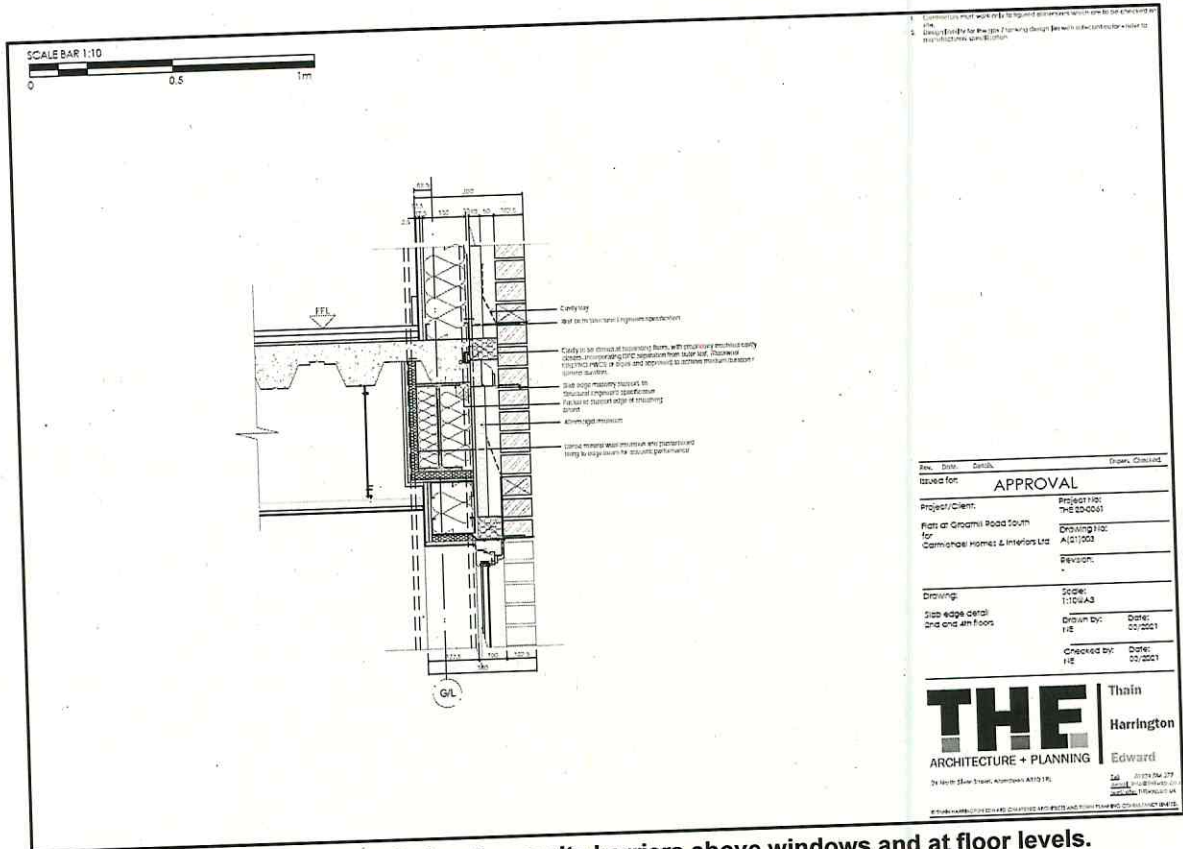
Sectional detail showing cavity barriers above windows and at floor levels.
